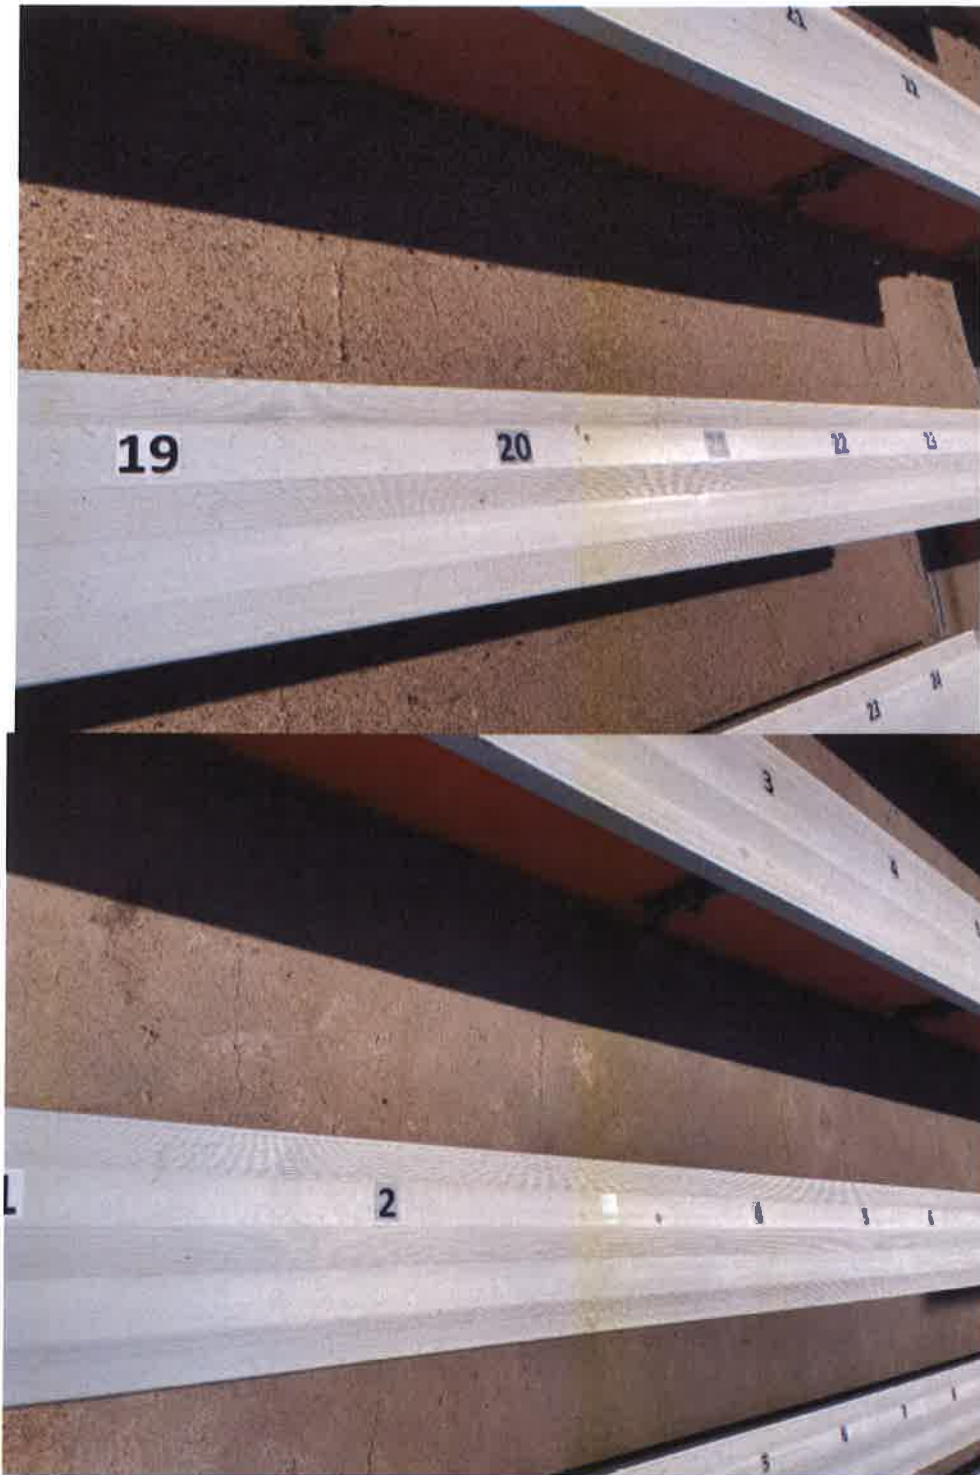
Typical Cracks at Uniformly Distributed For Entire Span on Each Beam
